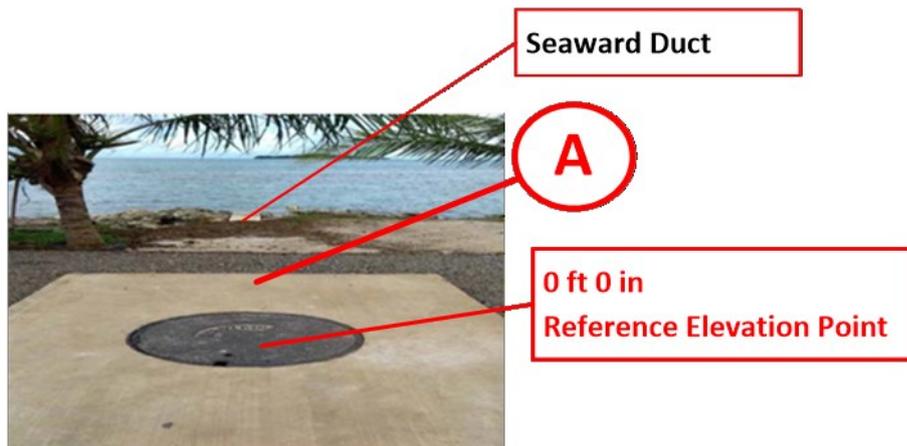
Beach Manhole and Seaward Duct Facing Lagoon with Reference Point A and Zero Elevation Point Denoted.
